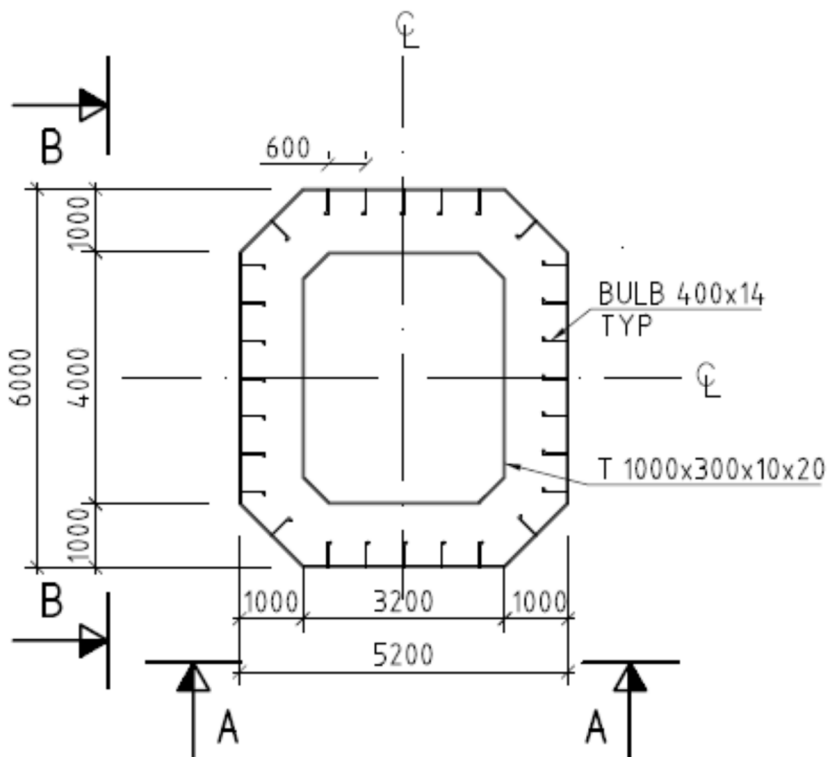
Columns cross-section, Axis 9-40. SBJ-33-C5-AMC-22-DR-481 /1/.
